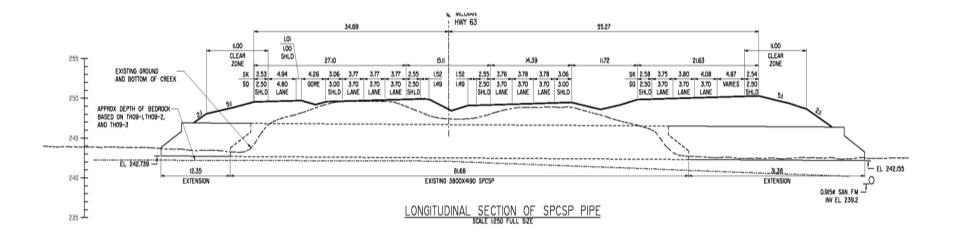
Proposed Highway 63 Cross Section at Conn Creek
